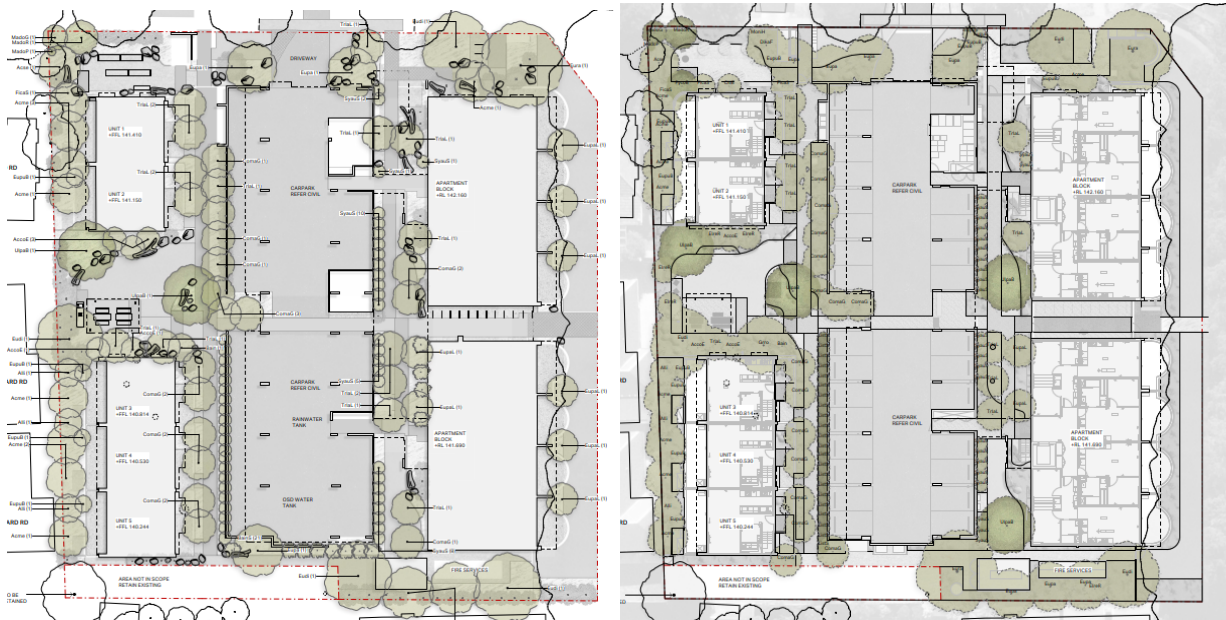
Decision plans (left) and proposed plans (right) showing revised canopy tree planting
